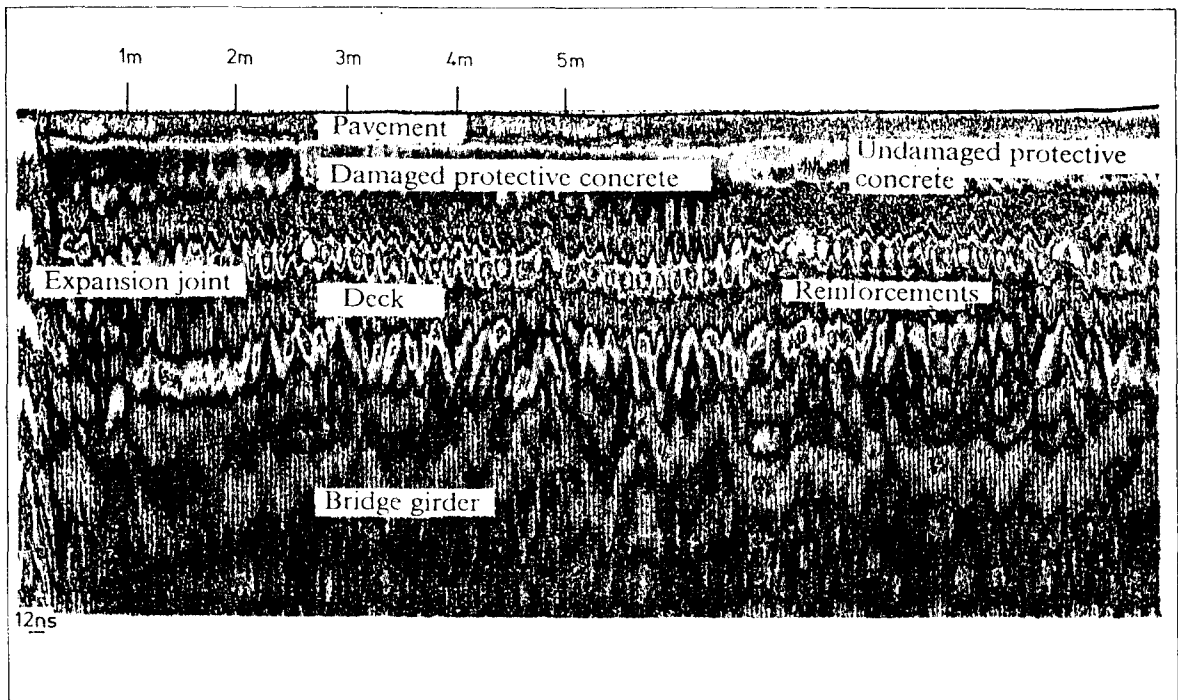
Examination of concrete bridge deck damage at Patoniva, Utsjoki. The damage in the protective concrete under the pavement can be perceived from the radar profile. 1000 MHz antenna, measurement time (range) 12 ns.
